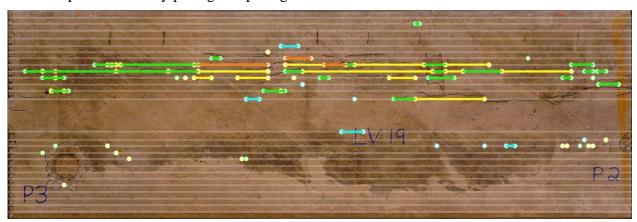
Damage Profile for Lakeview Drive Bridge Beam 19
